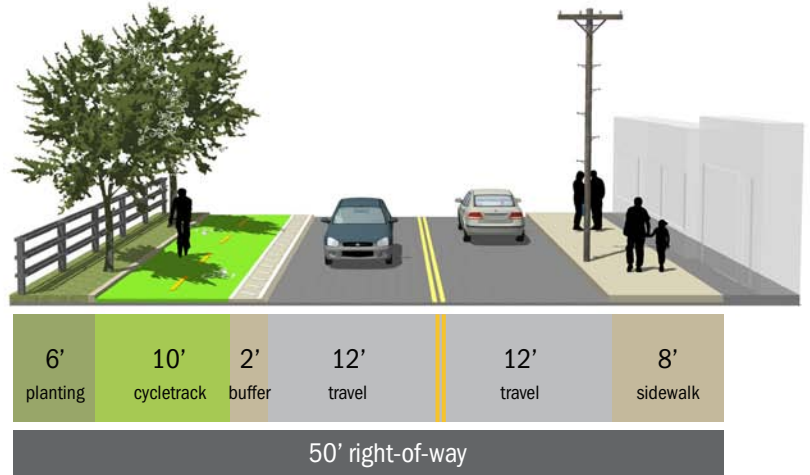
Proposed Conceptual Cross-Section for Main Street North of Milport
